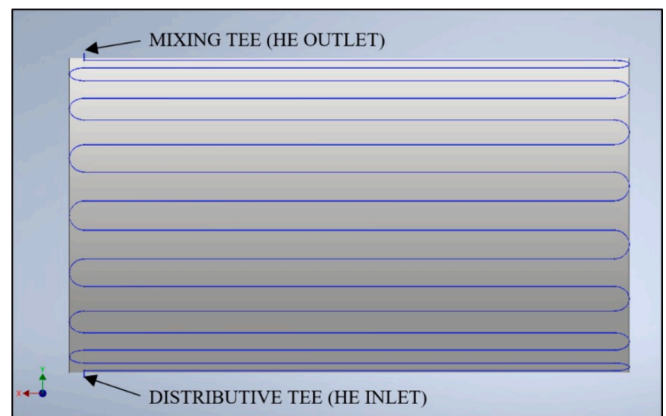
Side view of the serpentine cooling circuit(illustrative drawing).
